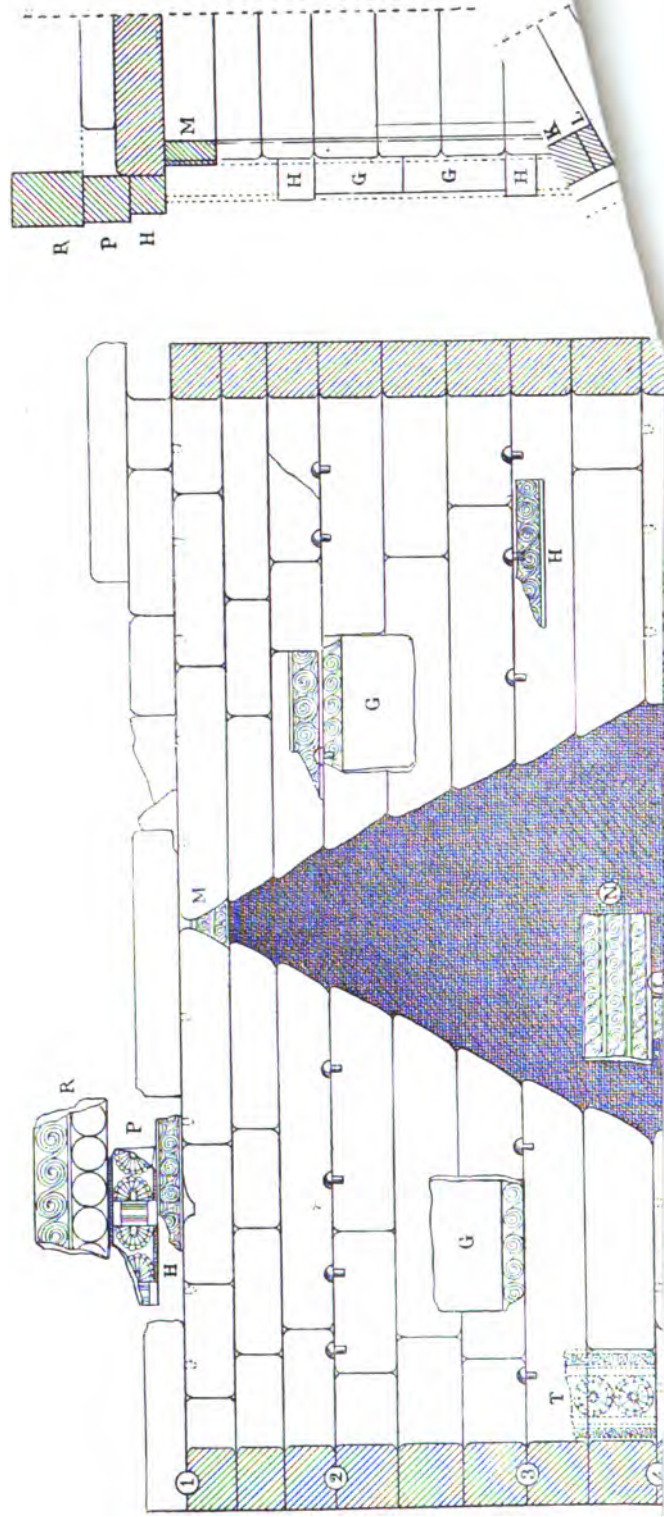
Tomb I. Elevation of entrance wall and section through lintel.
